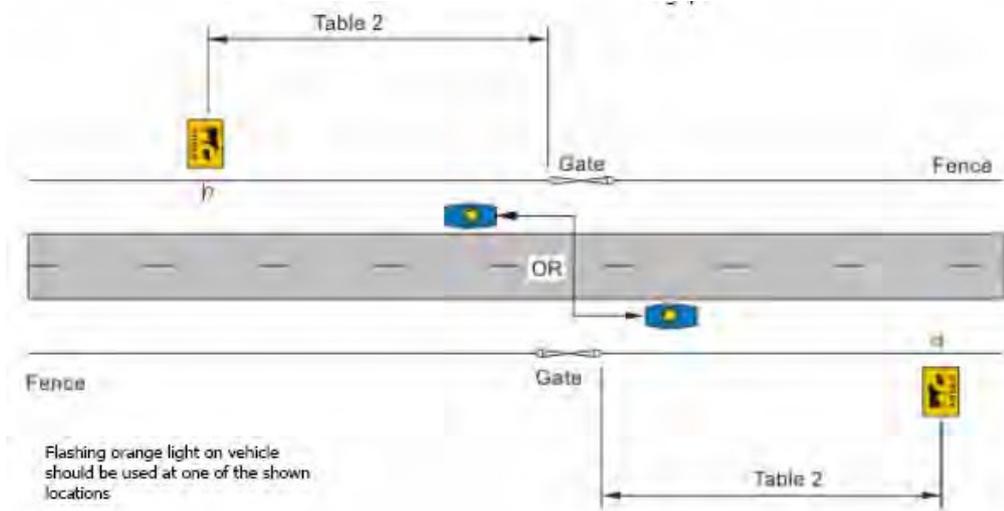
Typical Stock Crossing Site – for bitumen roads.
